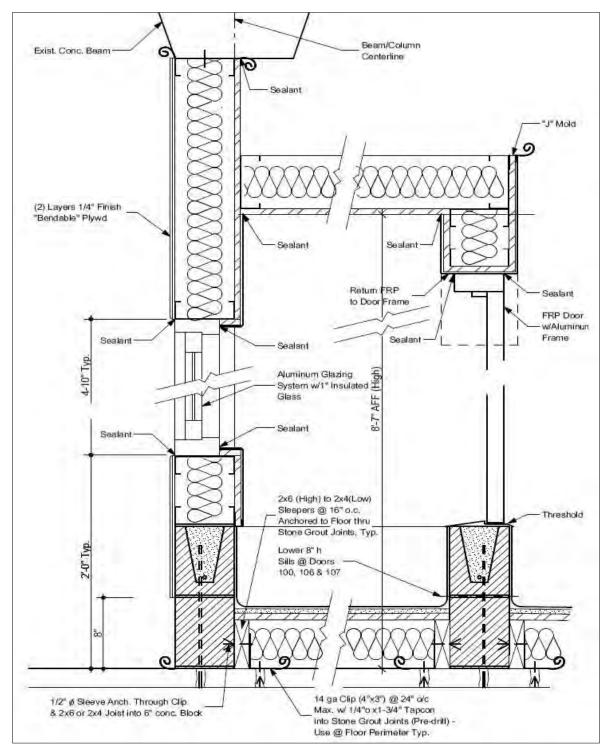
Detail for the floor, wall, and door structures. Note the elevated door threshold to prevent water from exiting and entering the room under the entrance door.
